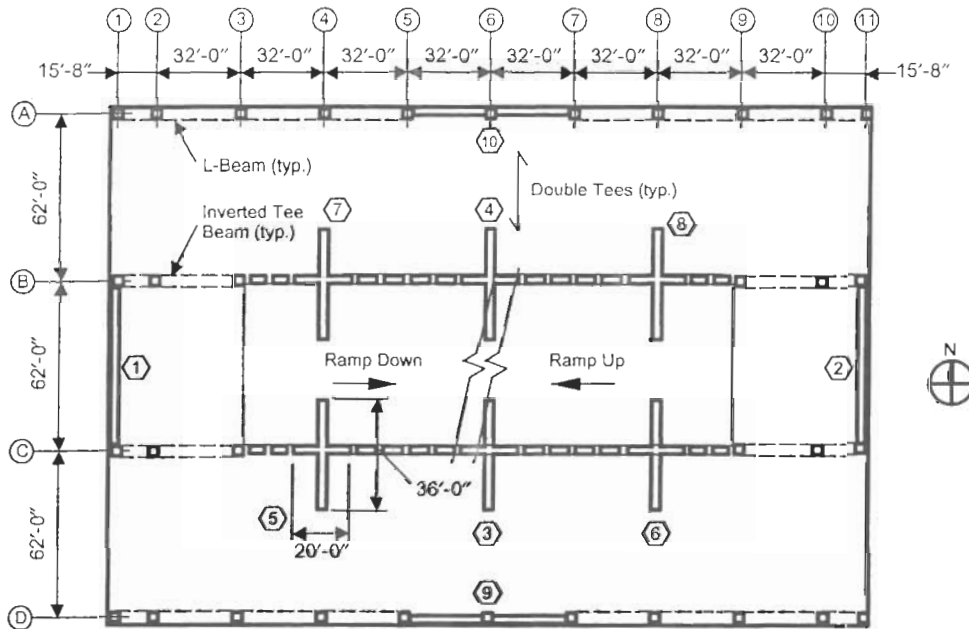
Typical Plan of Precast Parking Structure with Cast-in-place Shear Walls (SDC D)
